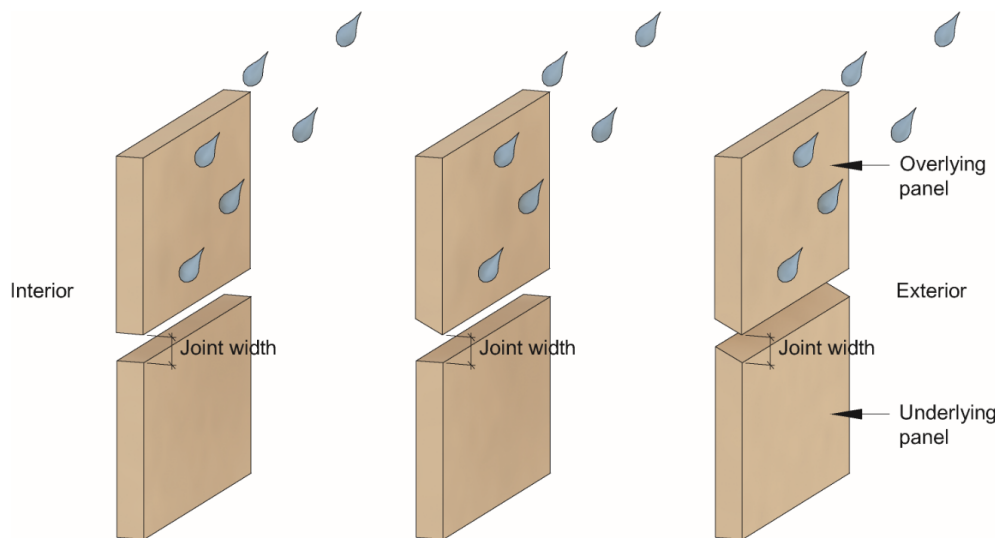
Different bevelled joint designs. Alternative 1 shows a rectangular joint. Alternative 2 shows a top-bevelled joint. Alternative 3 shows a top-and-bottom-bevelled joint.
